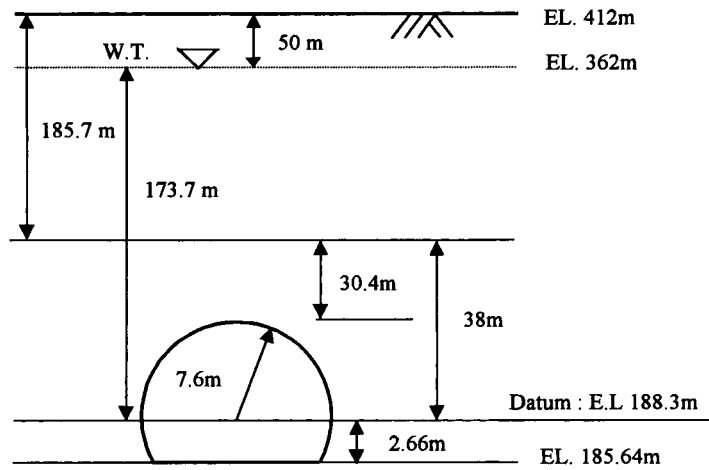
Ground condition of the Unju tunnel (station 109K 440).
